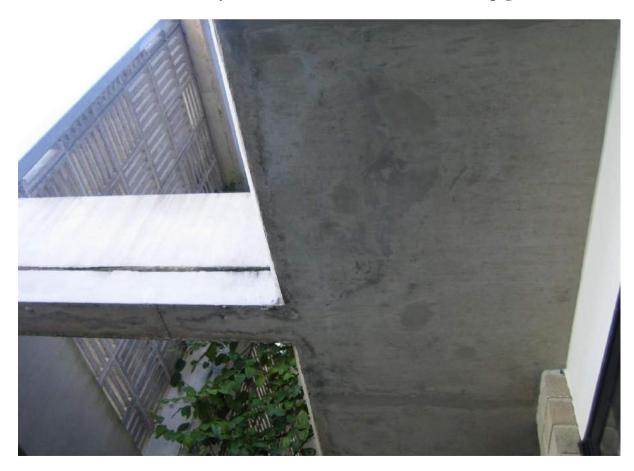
Soffit of balcony over bedroom 2 in Unit 212 has no drip-groove installed.
